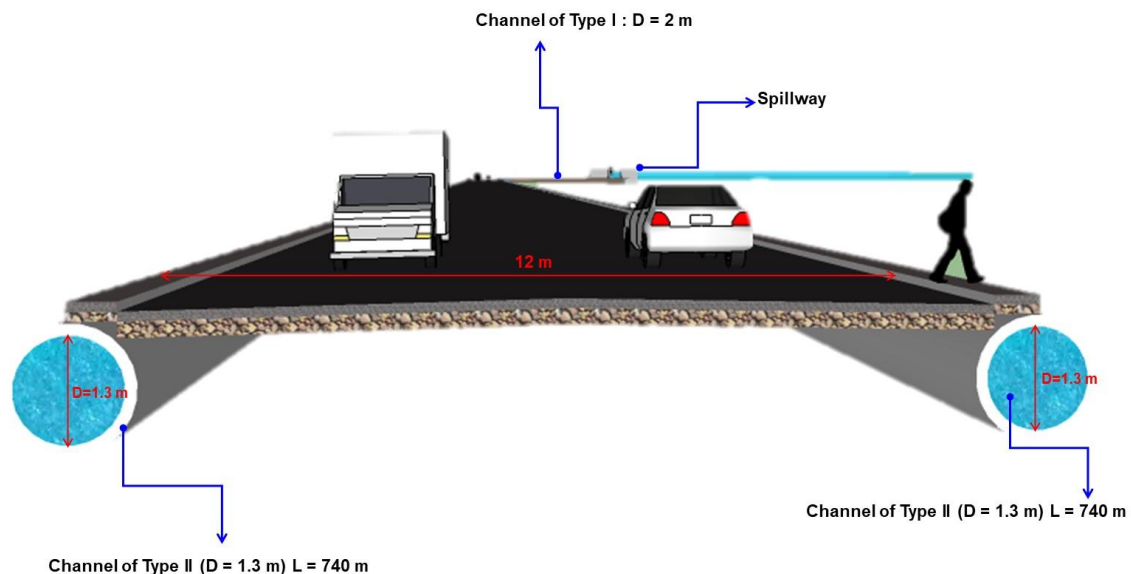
3D design of the road drainage culvert installation with a diameter of 1.3 m
